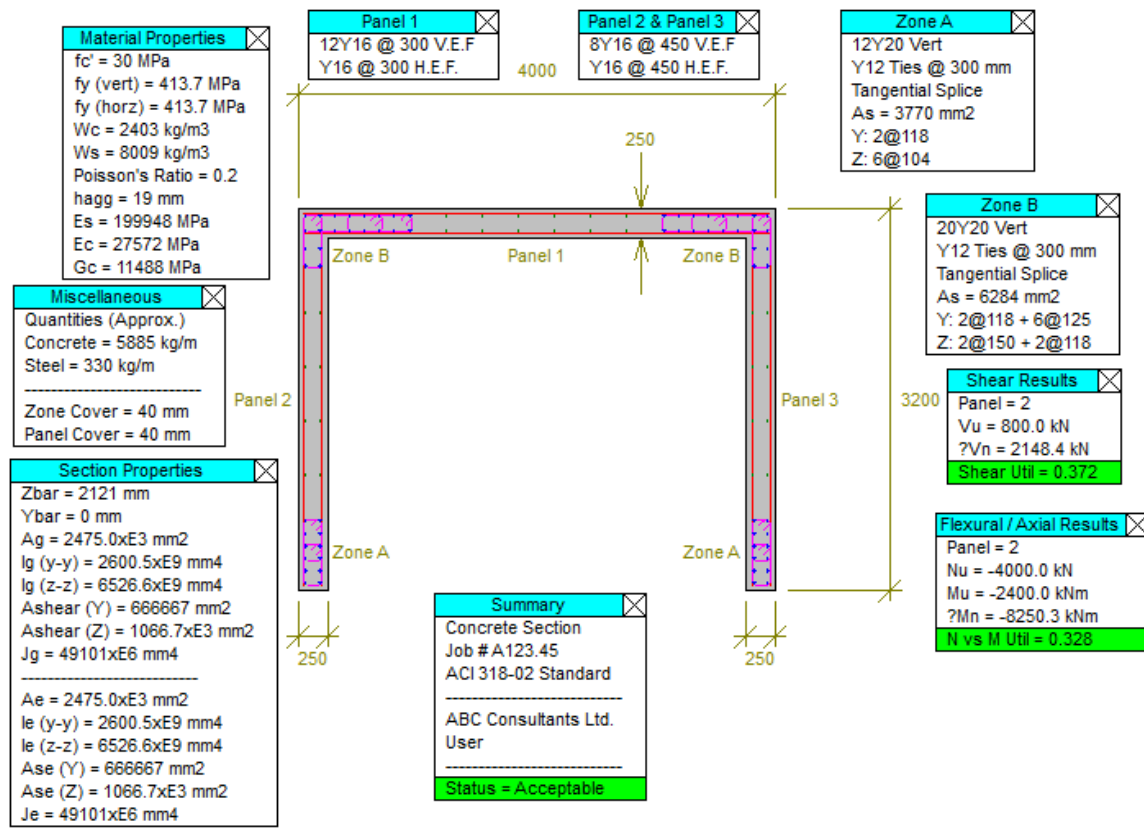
Reinforcement of shear wall provided by S-concrete at story 1
